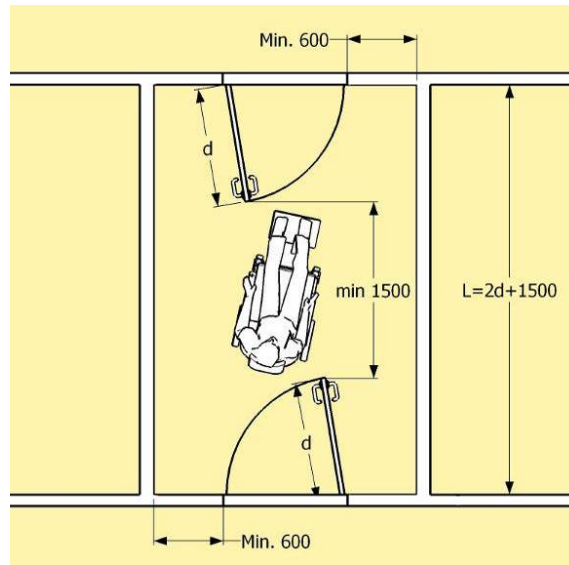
Minimum dimensions of lobbies with single leaf single swing doors
